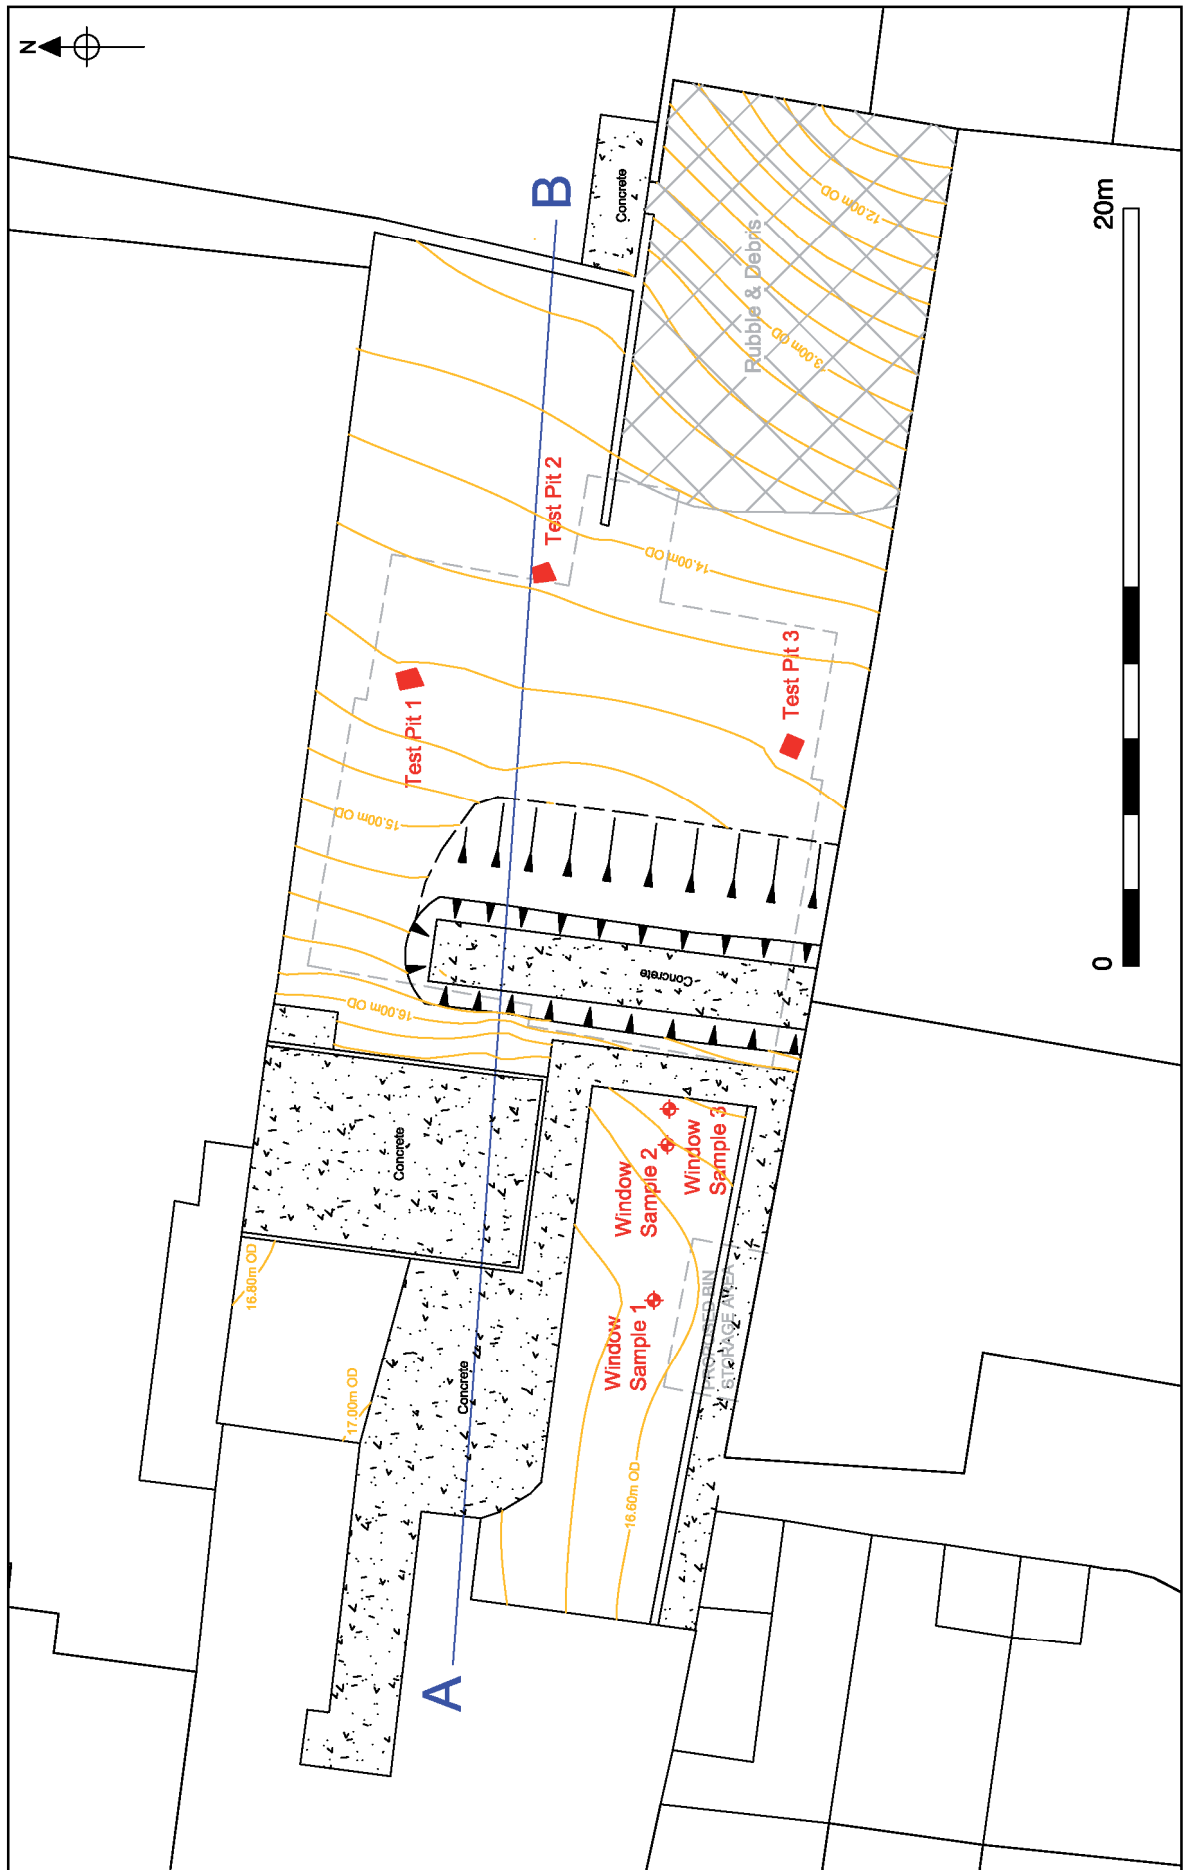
Detailed site plan, contour interval 0.2m. Scale 1:200
